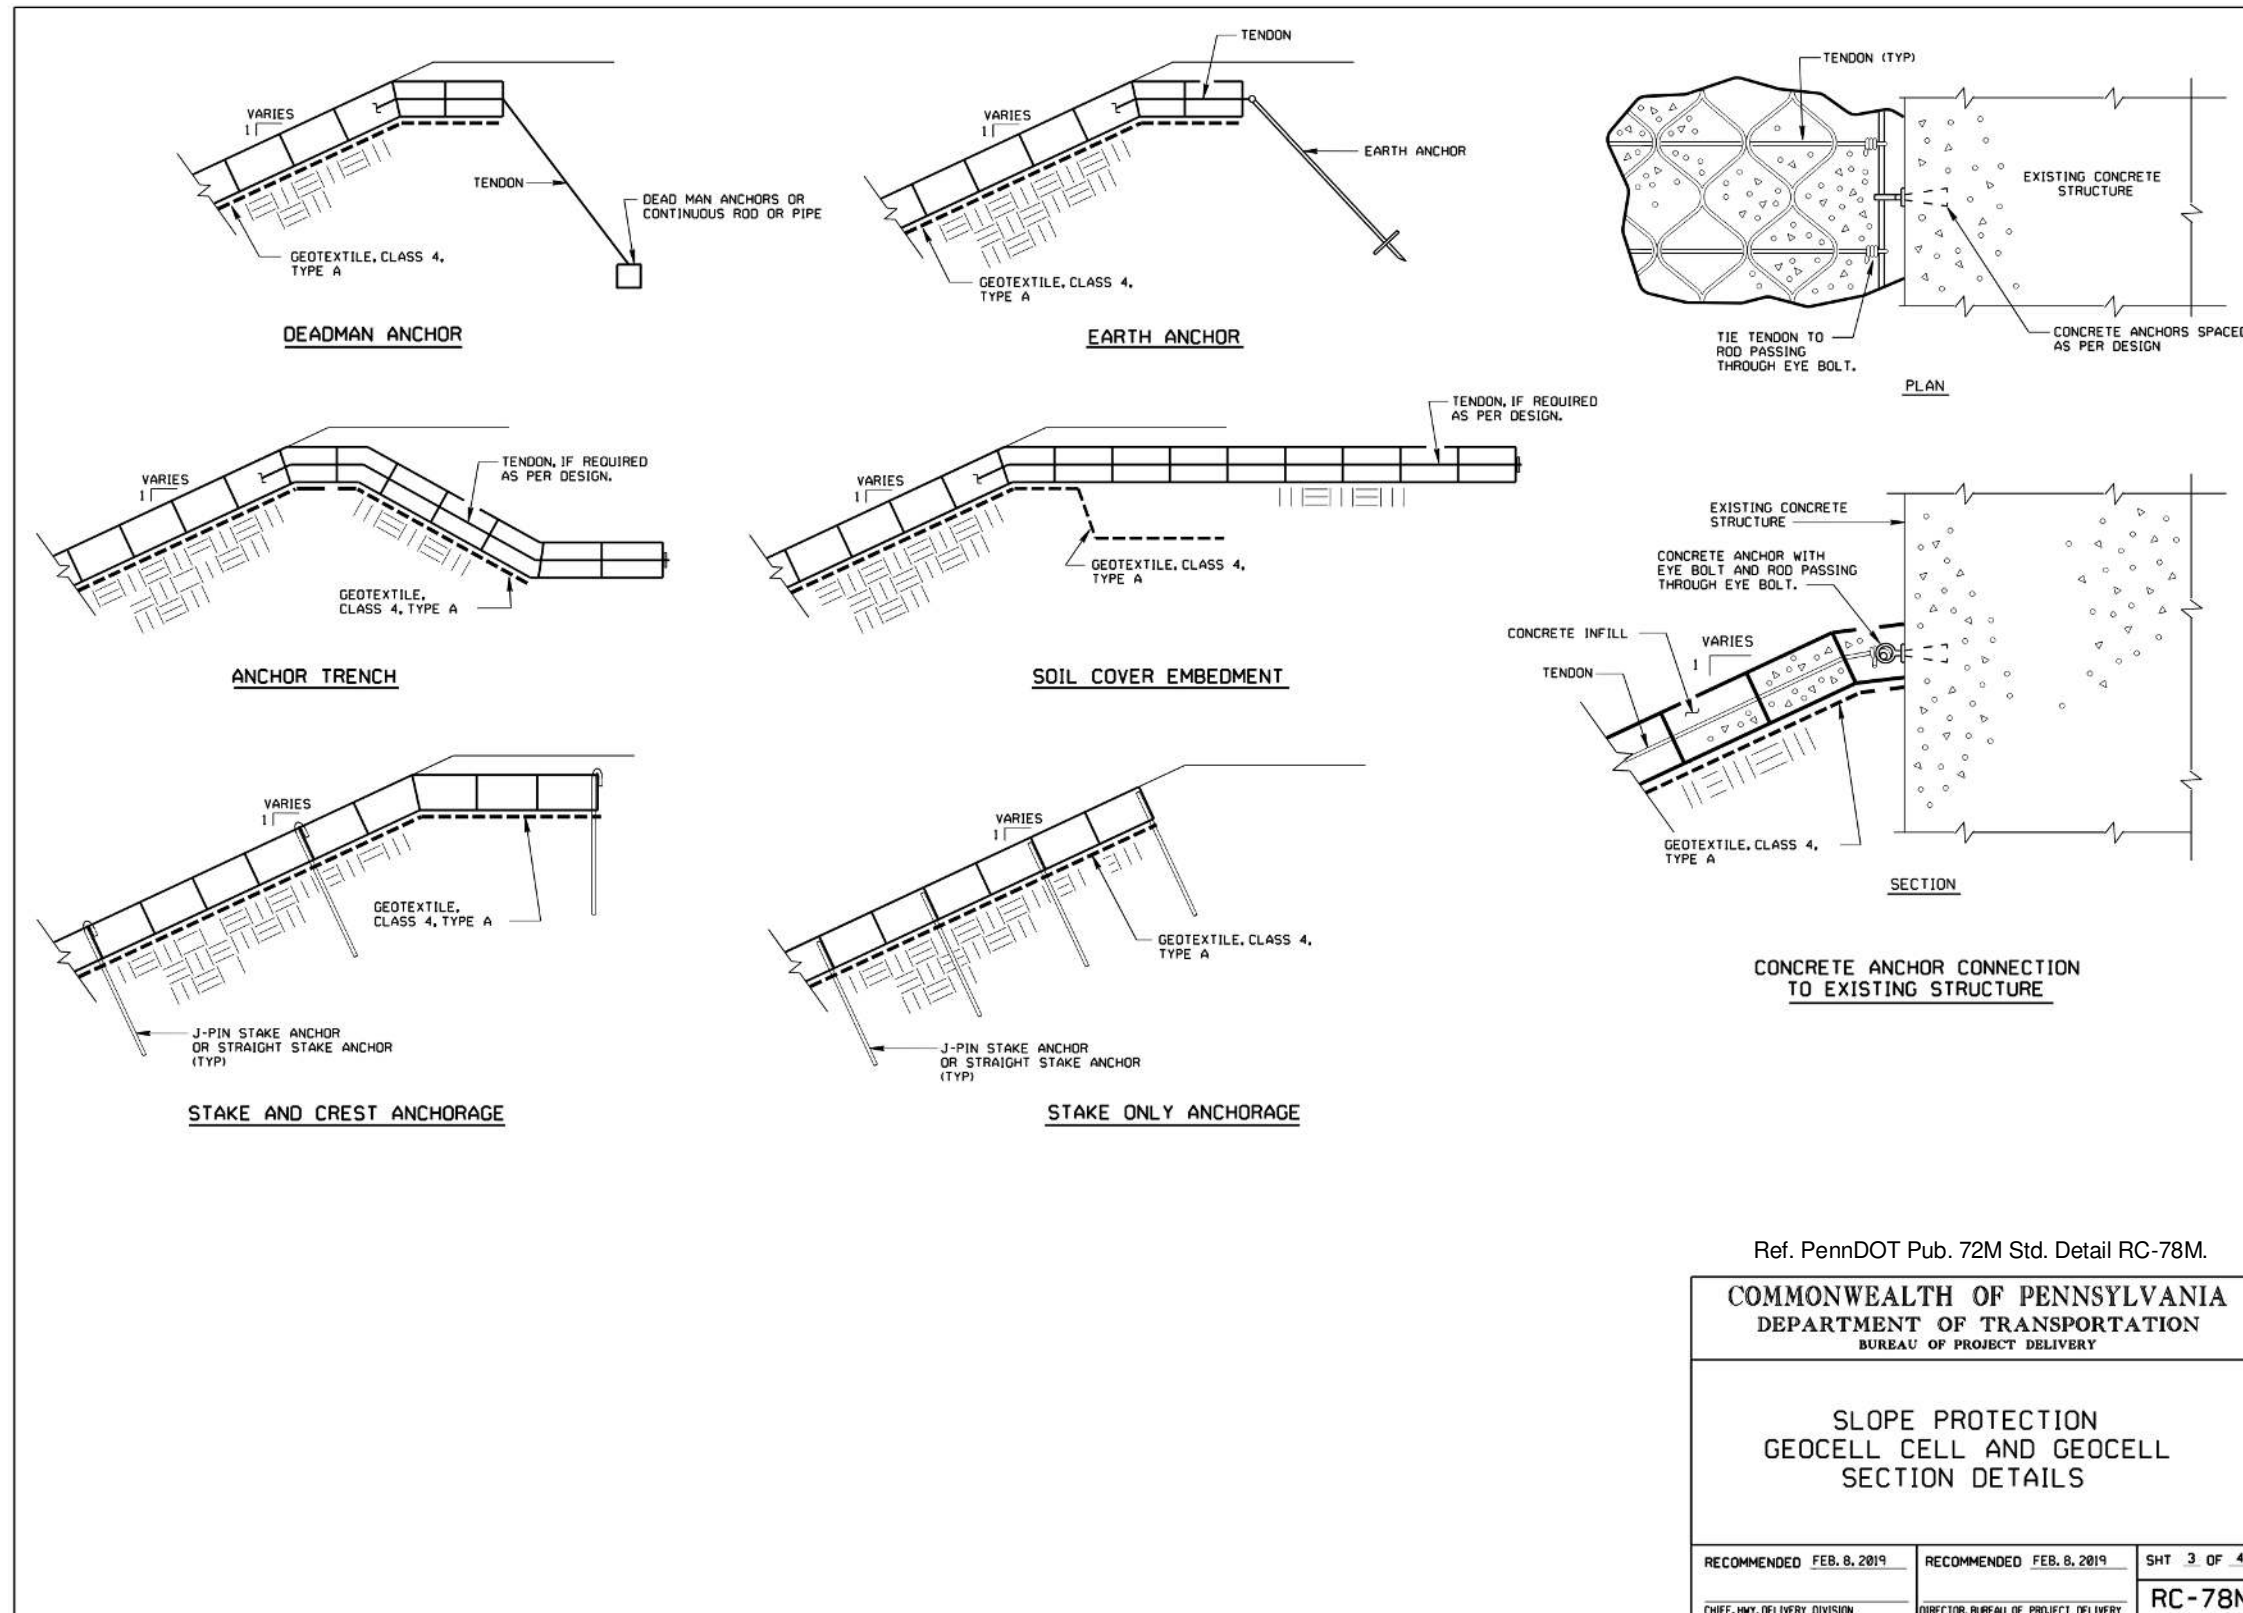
Typical Detail, Geocell (Sheet 3 of 4)
